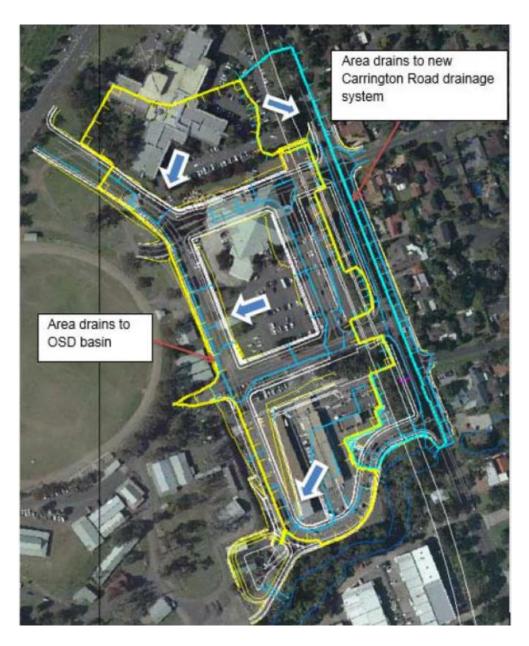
Existing Site Drainage (IWSCMS WSP, 2019)
